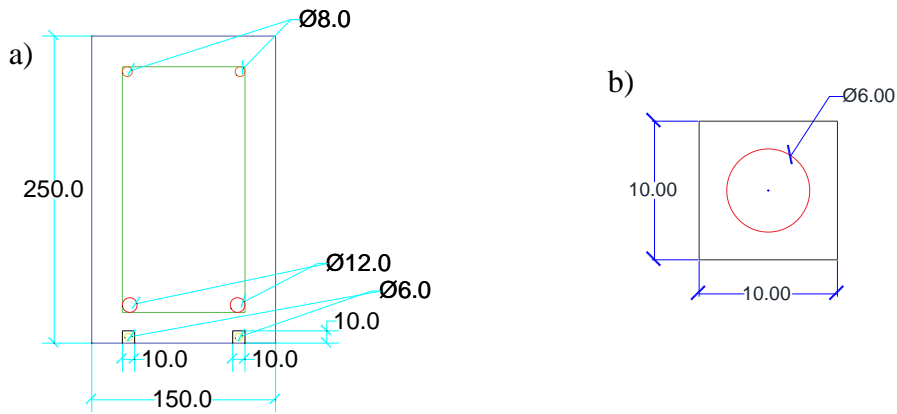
Detail of cross-section and groove for a beam with NSM-CFRP bar (all dimensions in mm).
